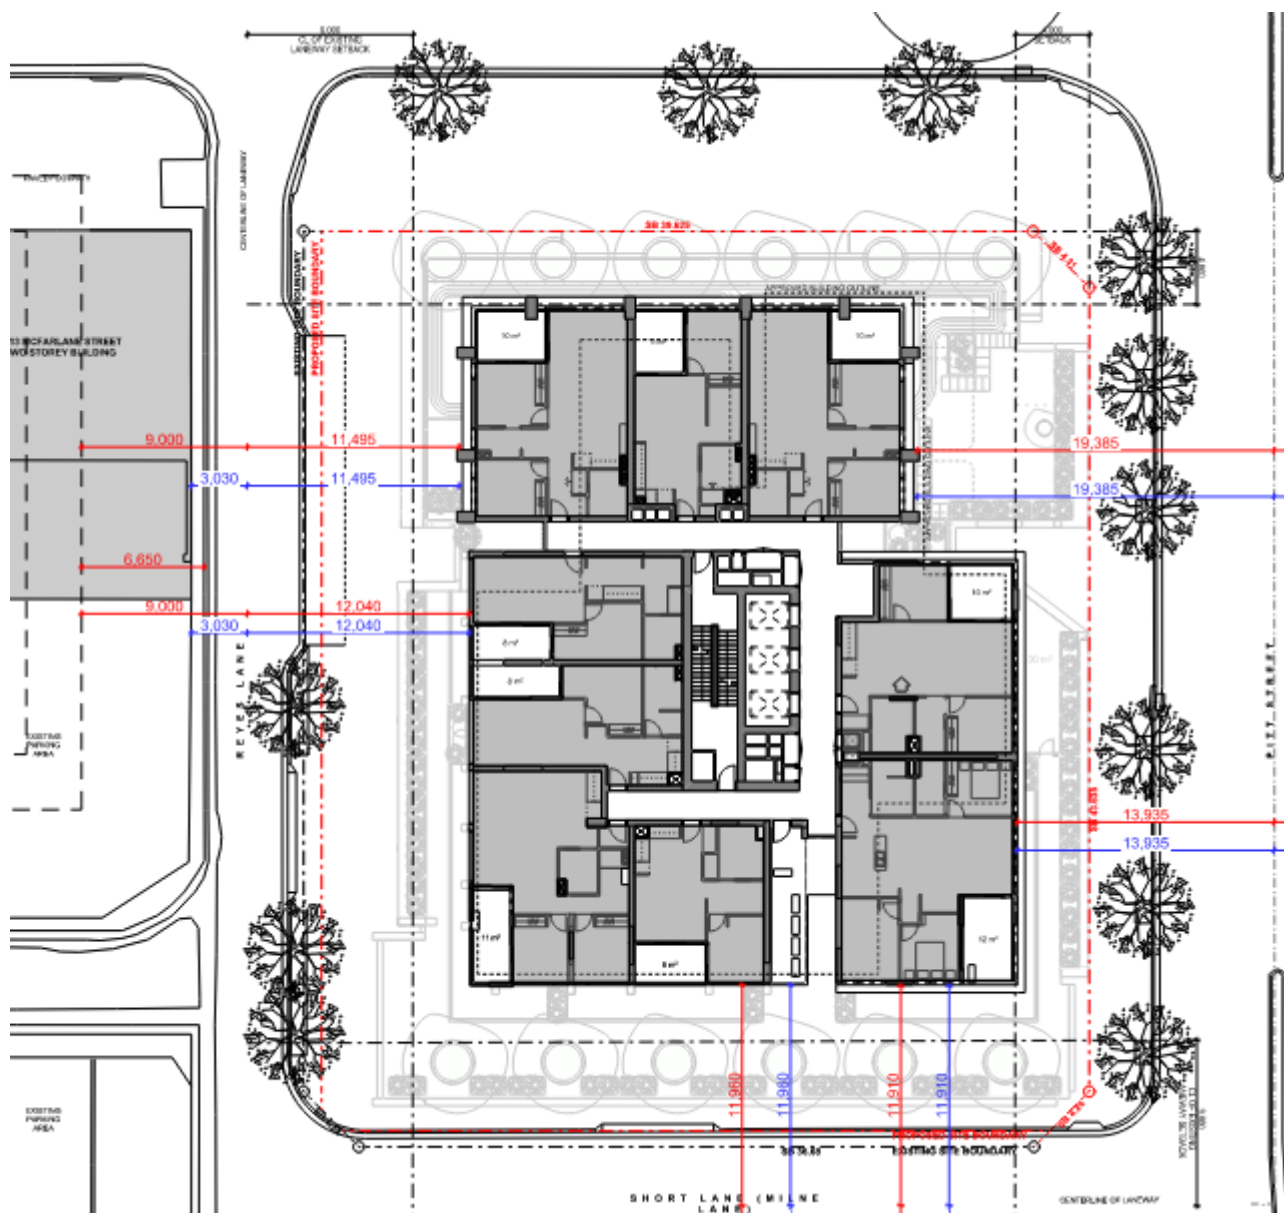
Extract of the proposed building separation plan (tower part of the building (i.e. above Level 3))
